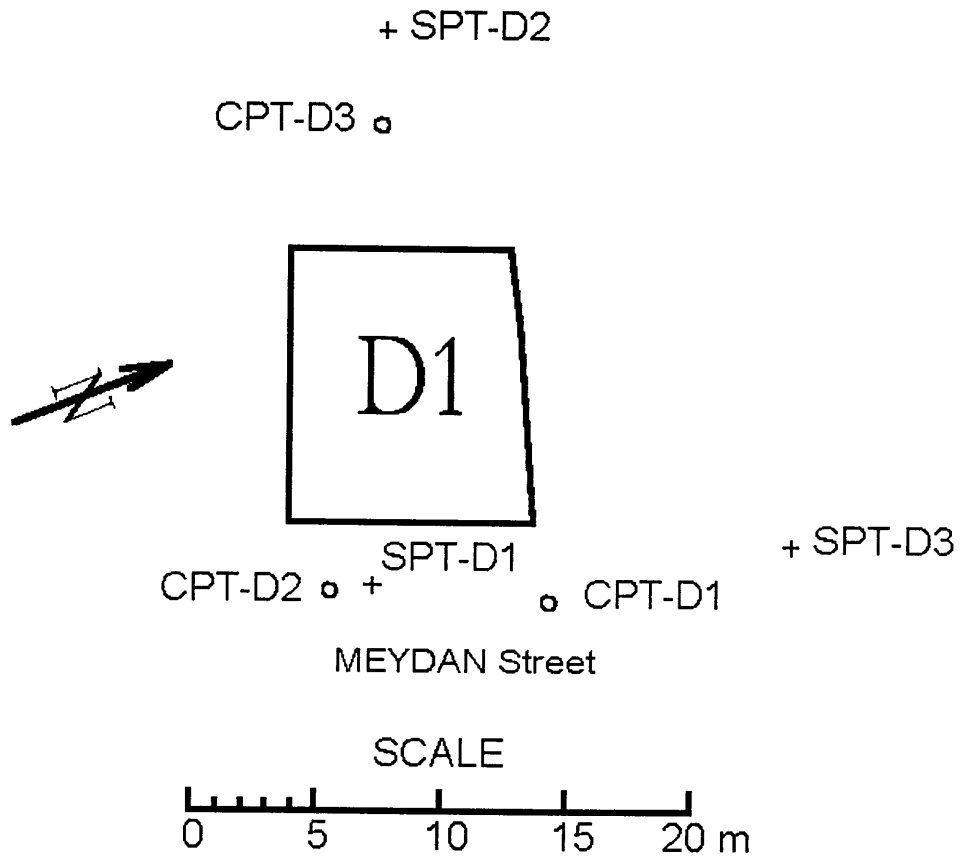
Plan view of Site D and location of subsurface exploration points
